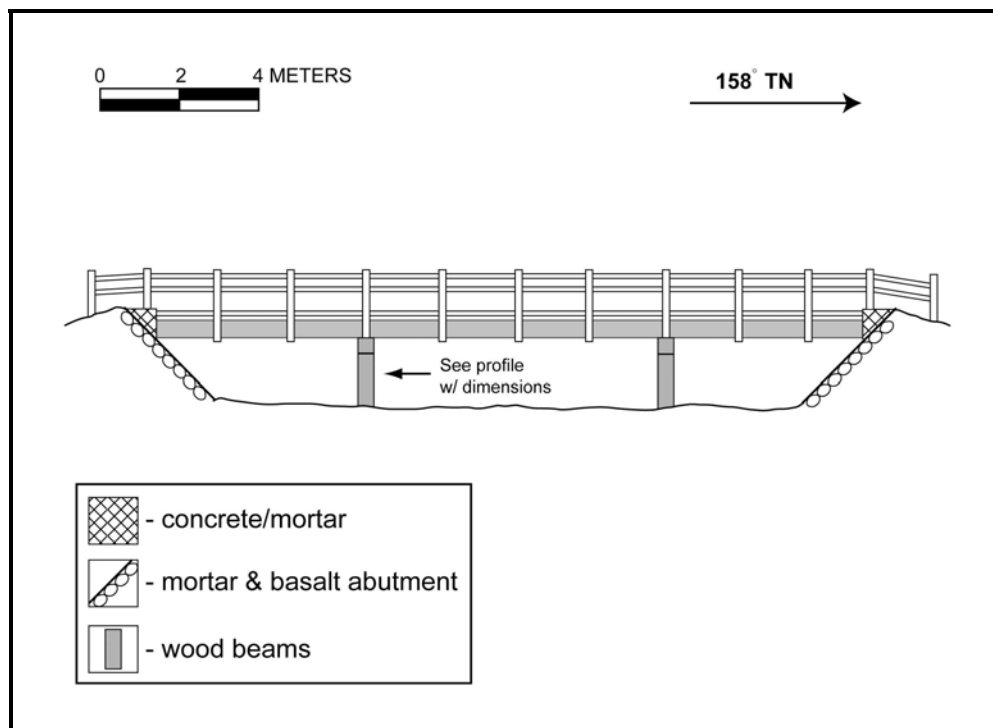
Elevation of SIHP # 50-80-07-6822 (a.k.a. Bridge 3)
